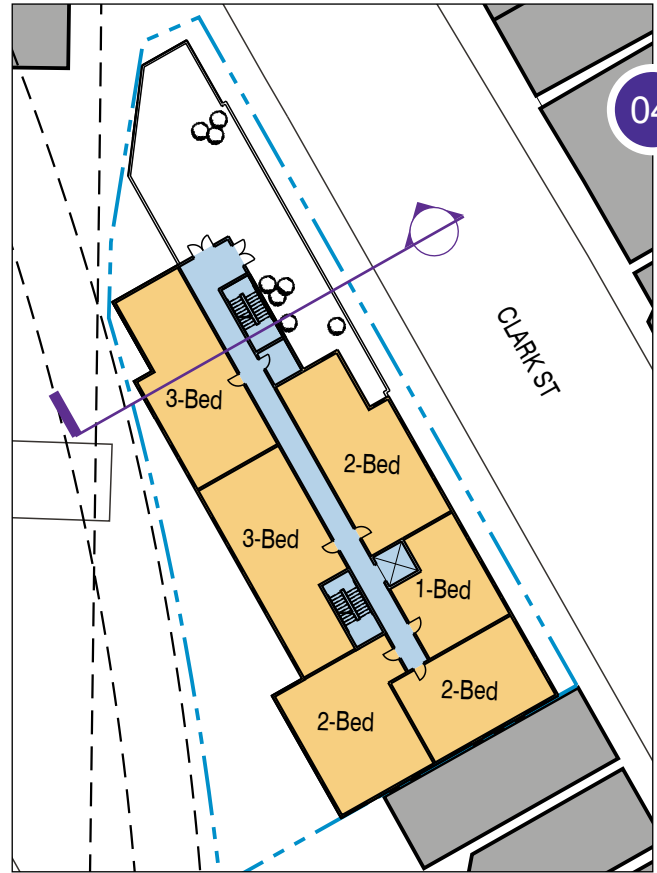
RPB 04 Development Concept Residential Floor Plans 4-5
